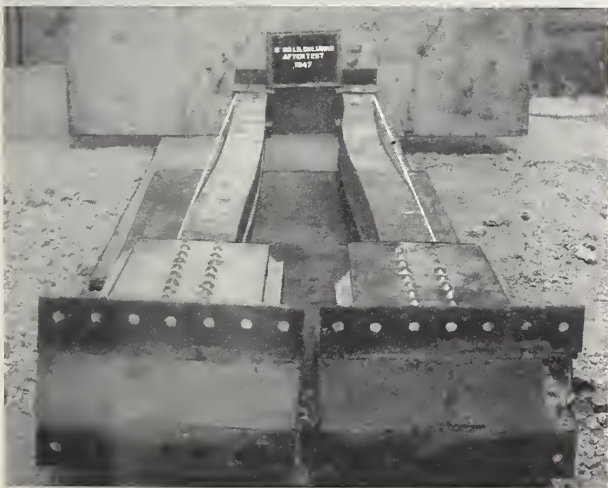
Condition of columns after tests 1 and 2—Concrete removed.
